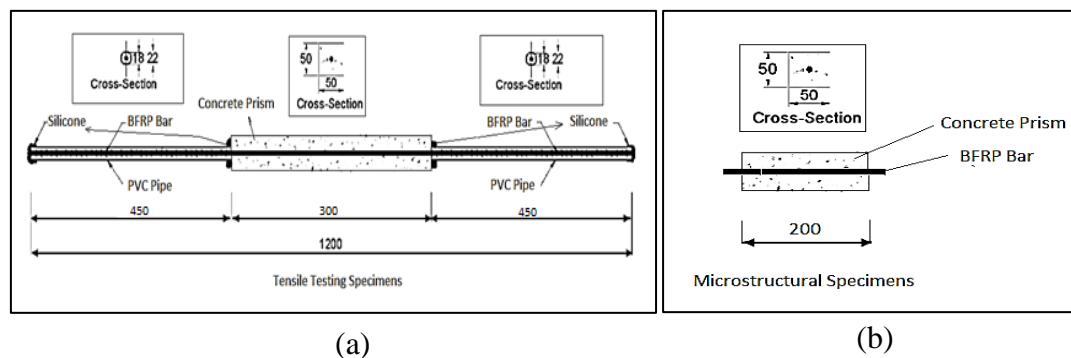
Concrete-wrapped specimens detailing (in mm)
